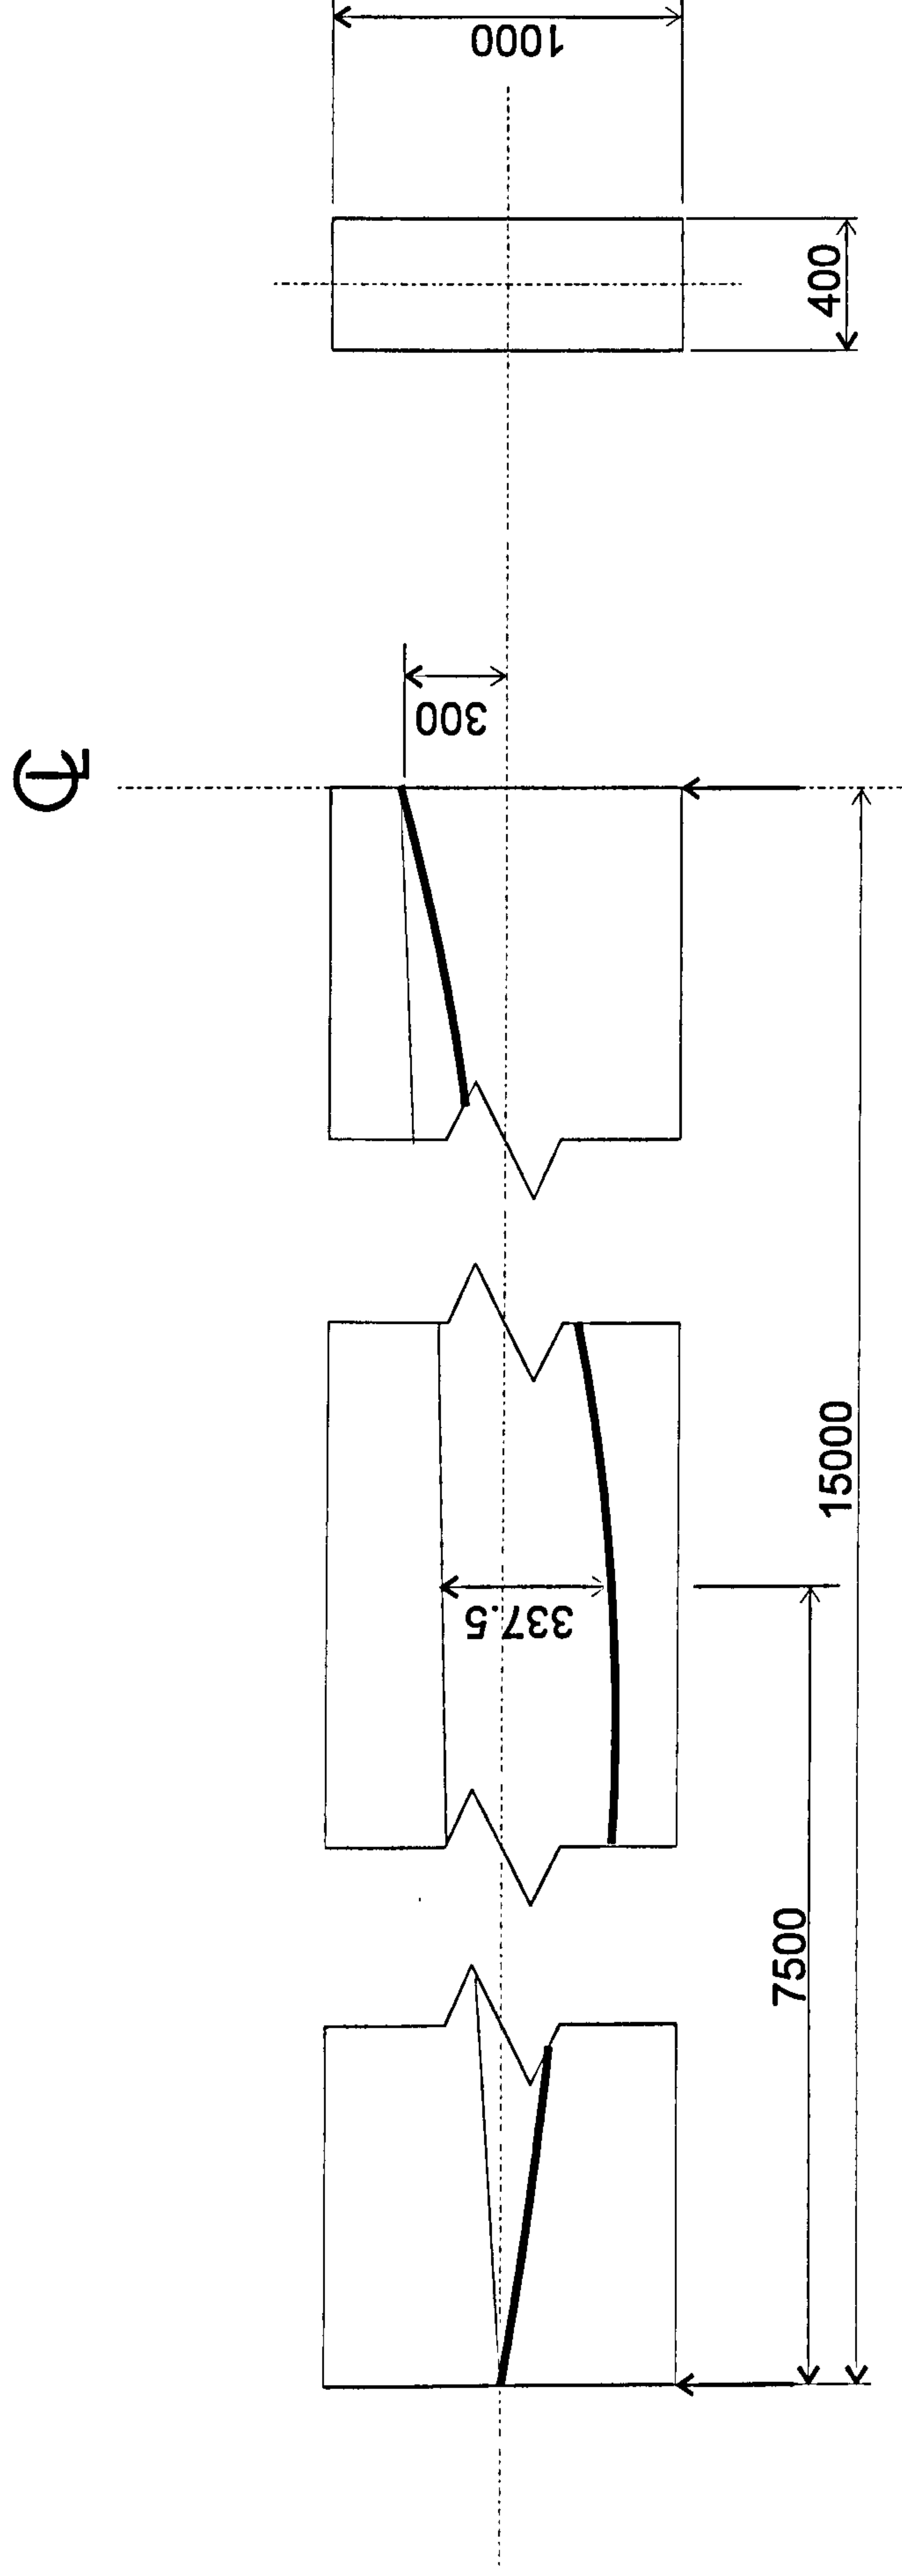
Tendon Layout and Overall Dimensions of Finite Element Beam Model 18 (all dimensions in mm)
